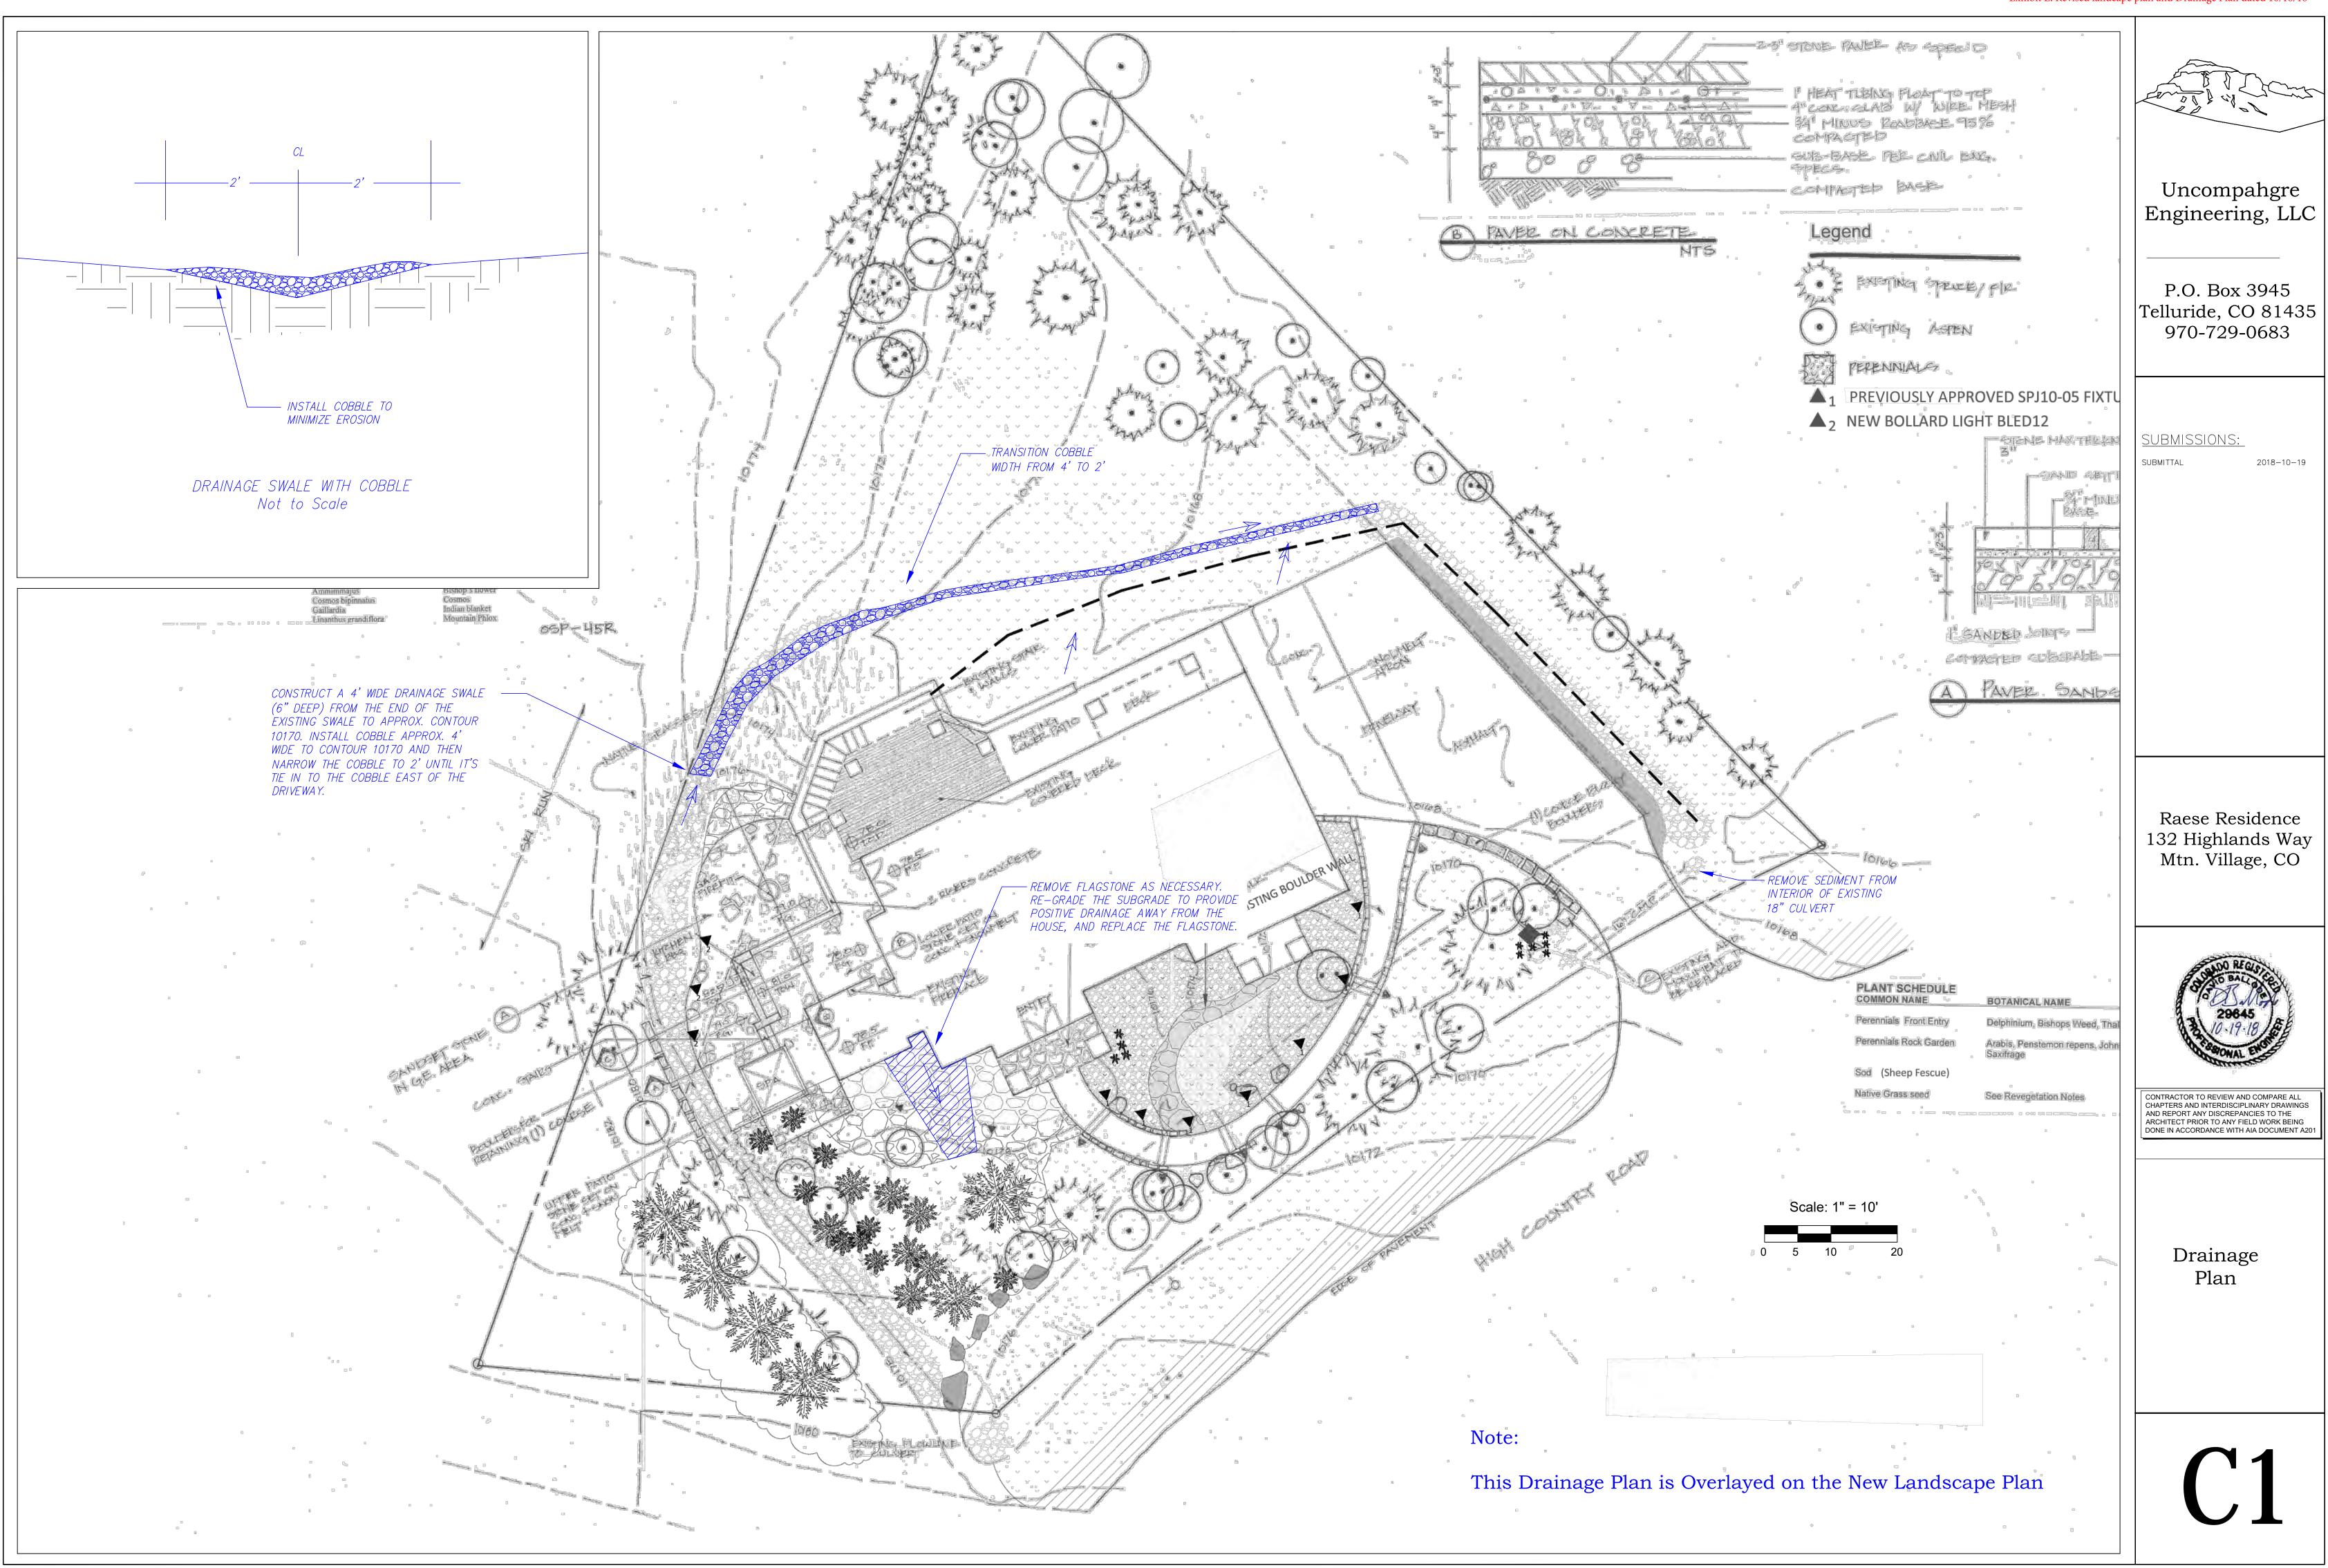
Exhibit E. Revised landcape plan and Drainage Plan dated 10/18/18
